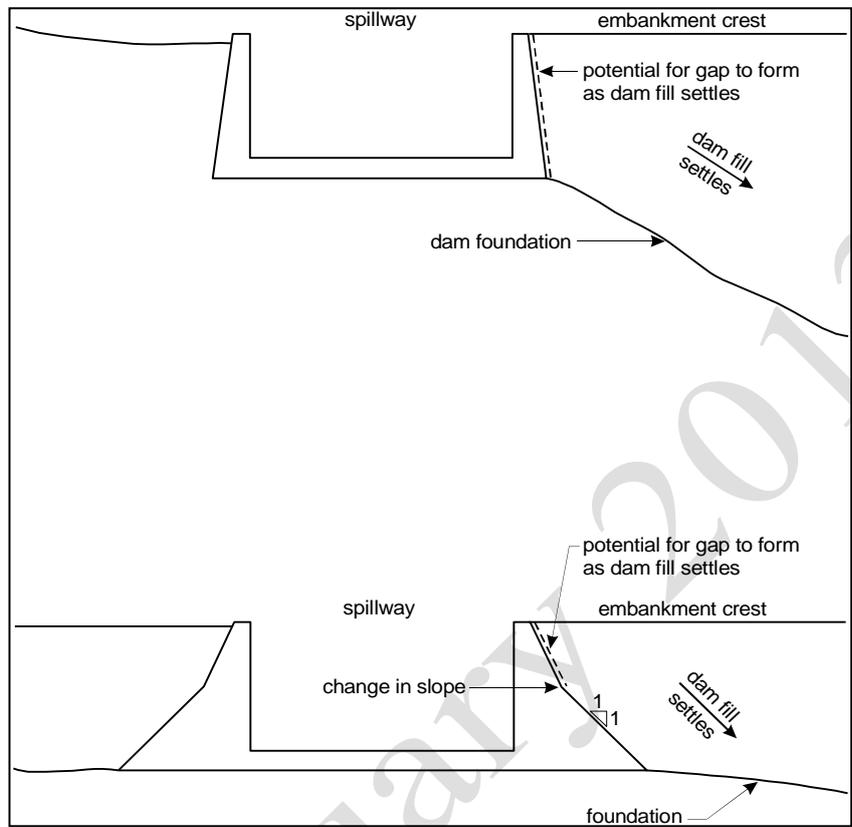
Situations where a gap may form between the dam fill and spillway wall (a) Steep foundation adjacent to spillway wall; (b) Change in slope of the retaining wall. (Fell et al, 2005)
